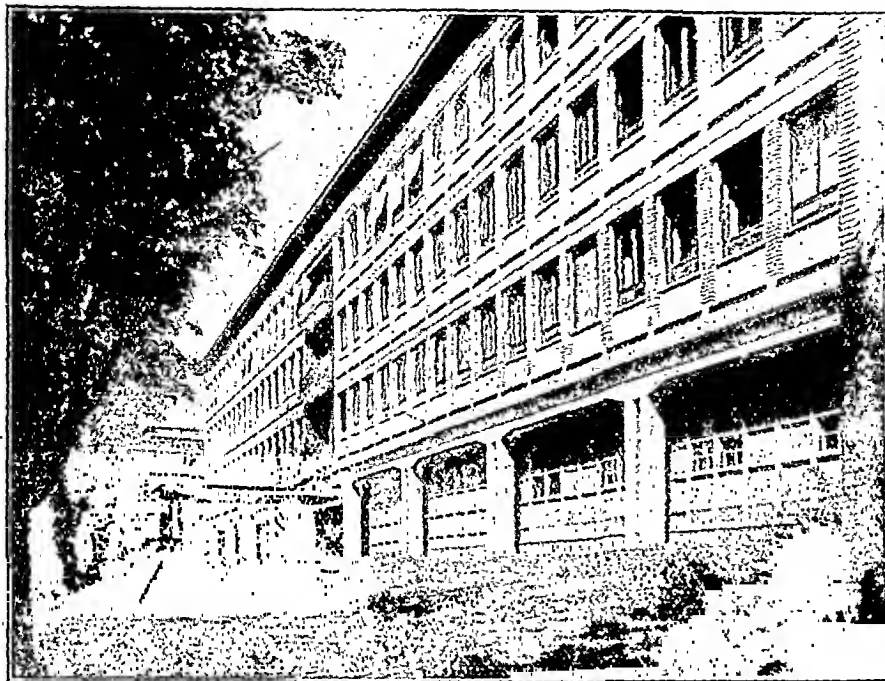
West elevation, with entrance ramp and principal entrance.
